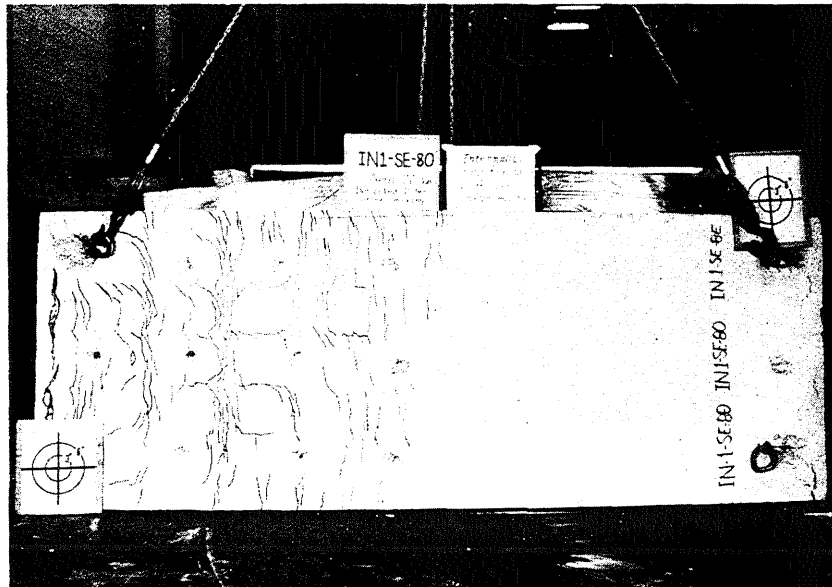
INTERNALLY REVIBRATED SLAB – RIGHT HALF OF SLAB FINISHED AFTER REVIBRATION
